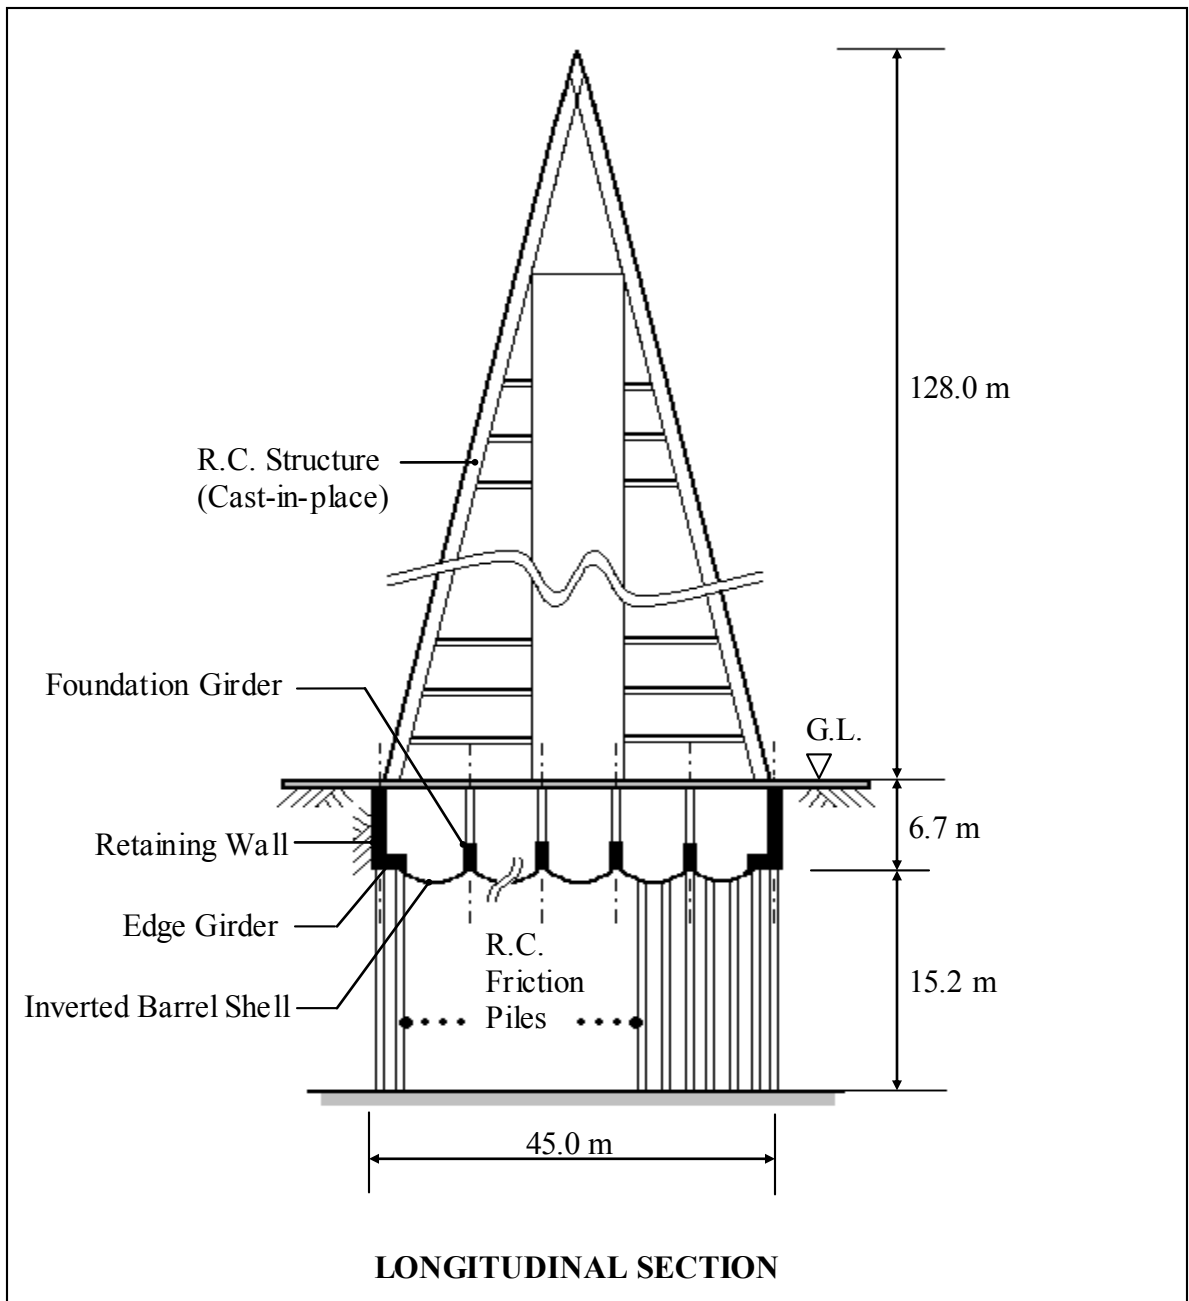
The Nonoalco Tower Foundation, Mexico (Enriquez and Fierro, 1963).
